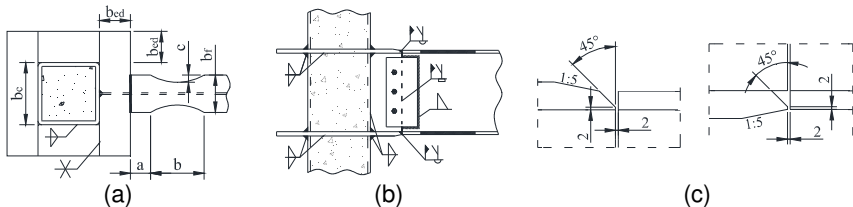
RBS joint configuration: (a) & (b) conceptual scheme, (c) weld preparation details for on-site welded connections (beam flanges to external diaphragm)
